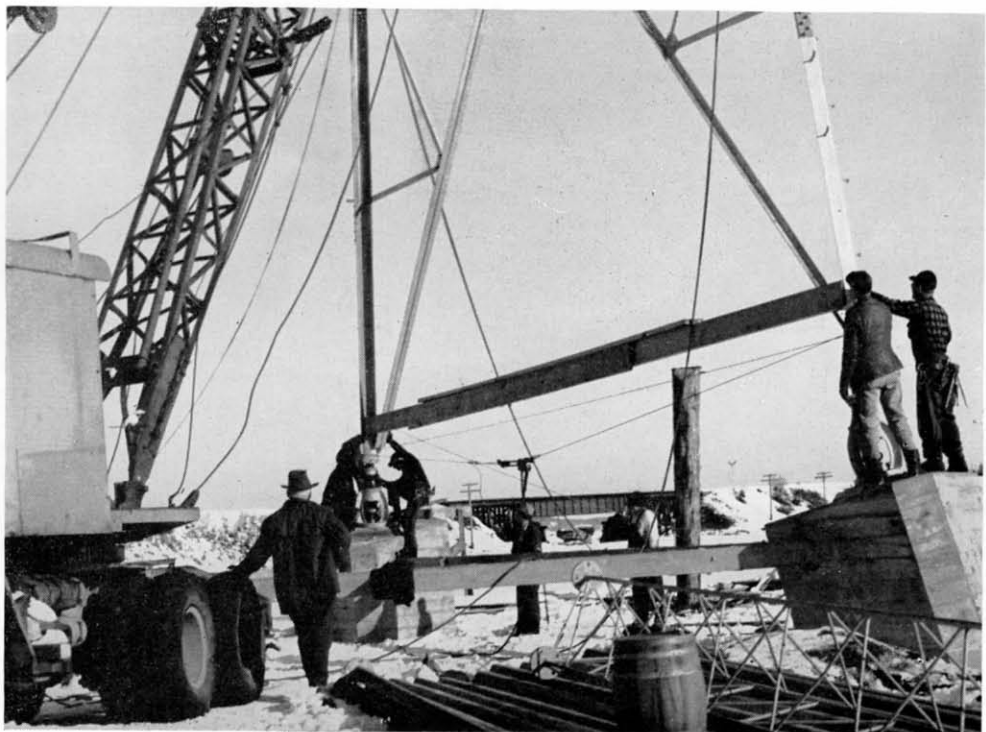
Capt. A. E. Lathrop (at left) watches construction of the antenna tower on the concrete pilings. Railroad trestle can be seen in background.
